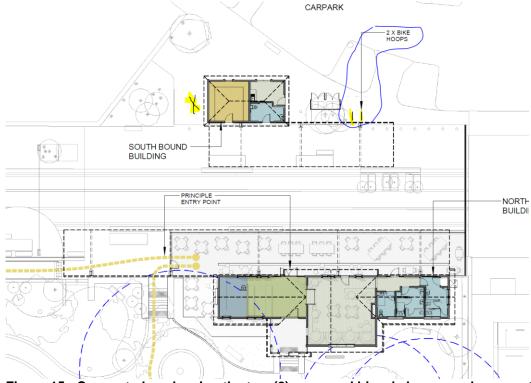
Concept plan showing the two (2) proposed bicycle hoops and a cross to indicate approximate location of existing bicycle hoops.
